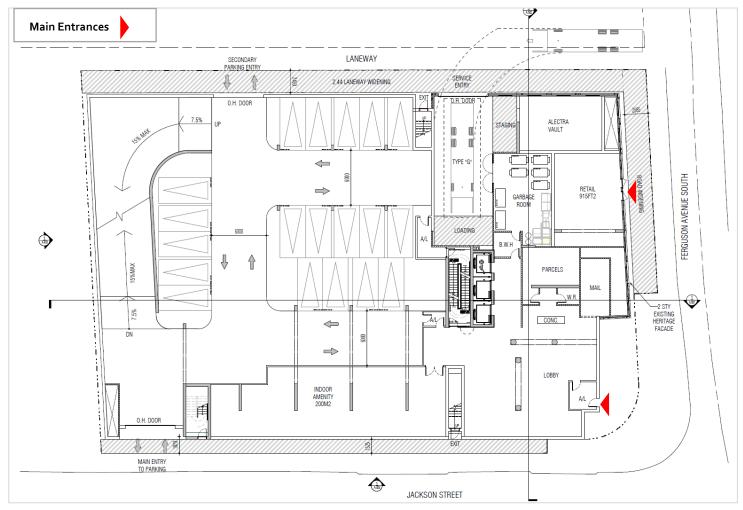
Proposed Ground Floor Plan, Courtesy: Graziani + Corazza Architects
